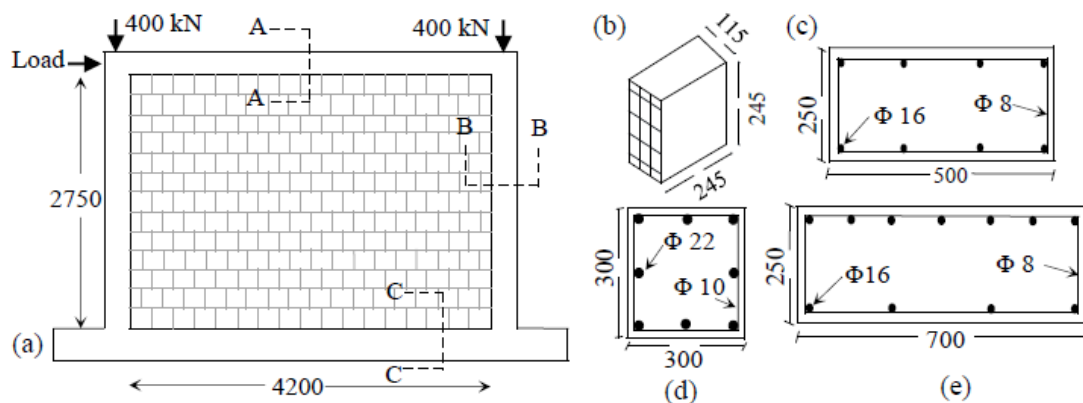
Geometric details (dimensions in mm) of (a) the tested infilled frame (b) the perforated clay block units, (c) top beam (section A-A), (d) column (section B-B), and (e) top beam (section C-C).
